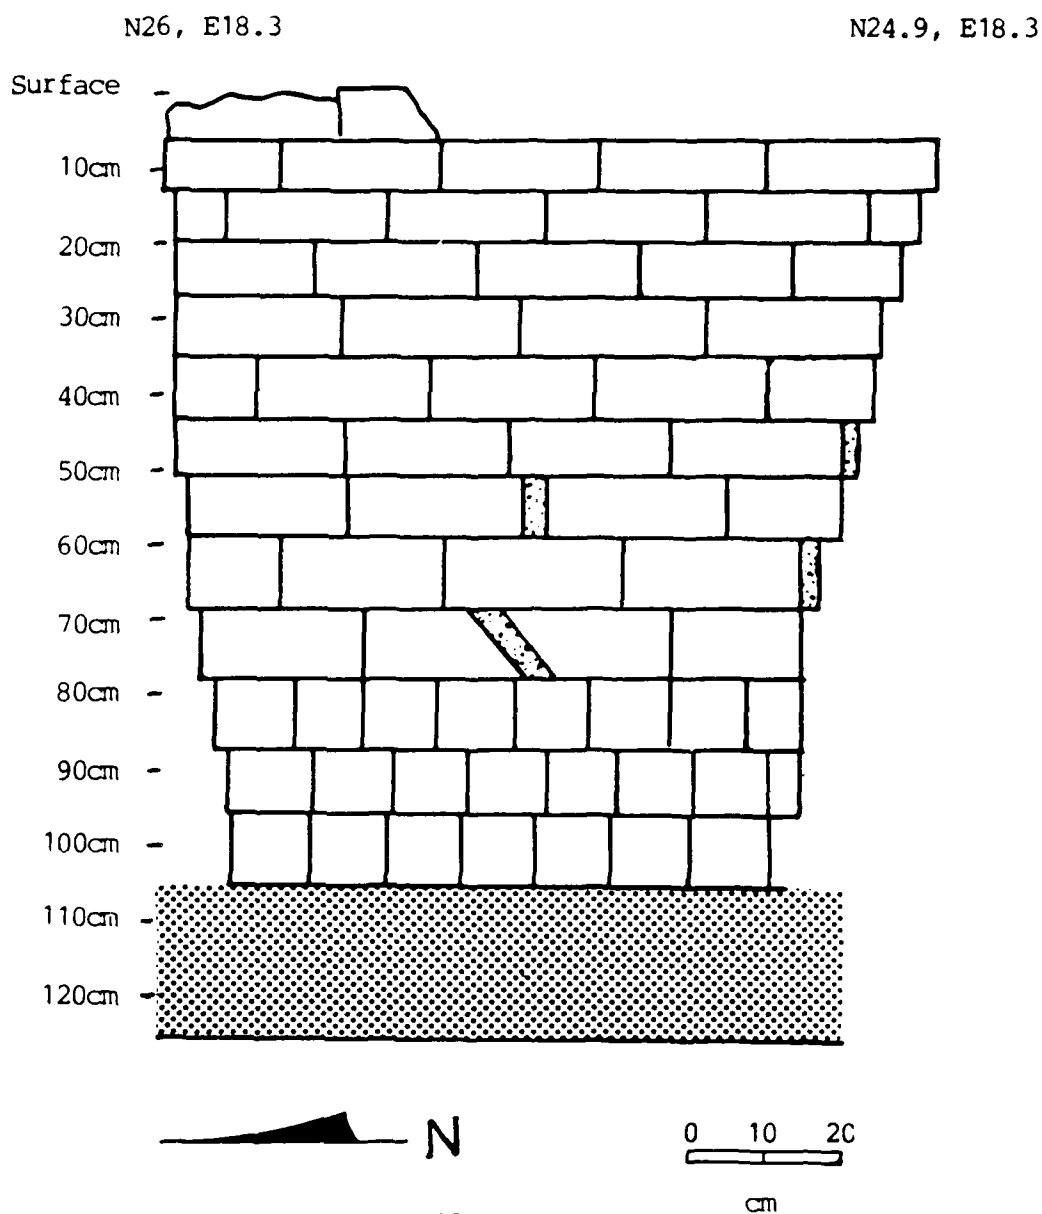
Plan view of Feature 39, a brick iron punch foundation.
